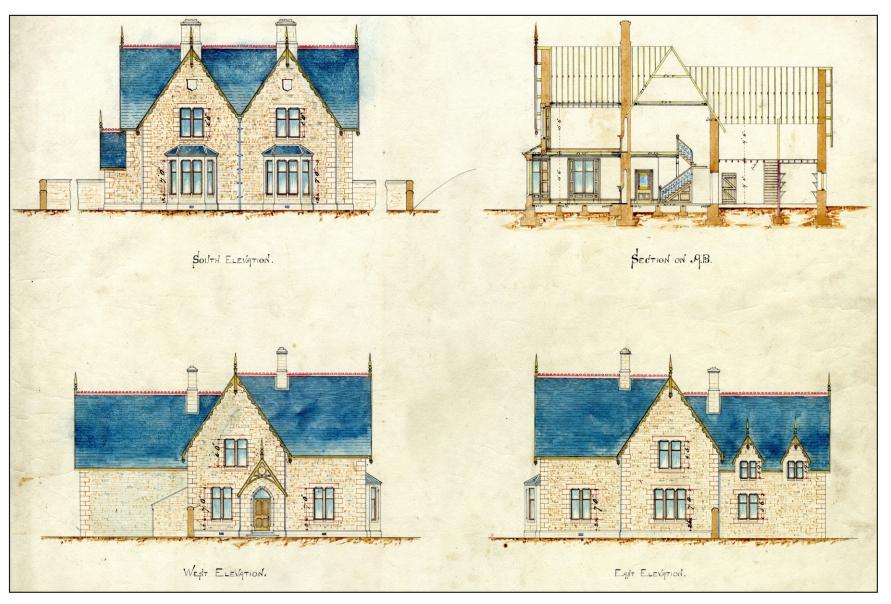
Elevations relating to the construction of a parsonage at Horsley, 1880's (ROC_M&D 027)
